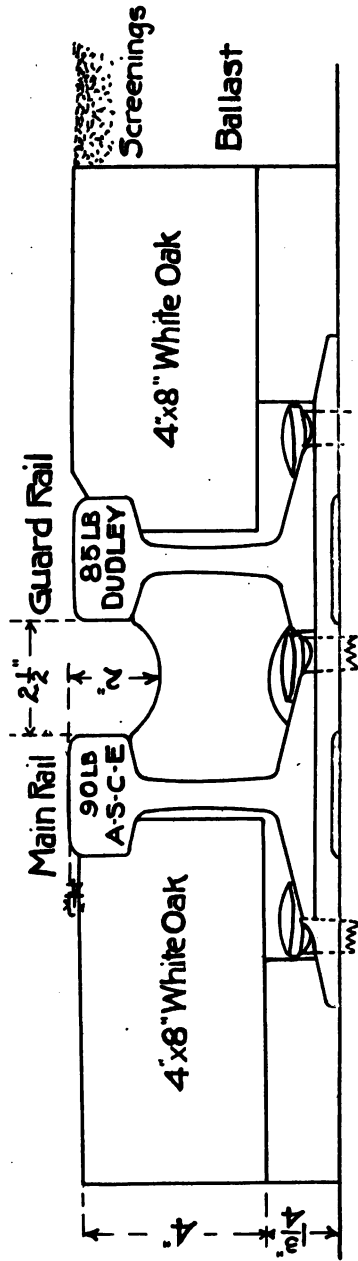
C. R. R. of N. J. Lt'd. Skew Road Crossing to Face Skew Plan.
